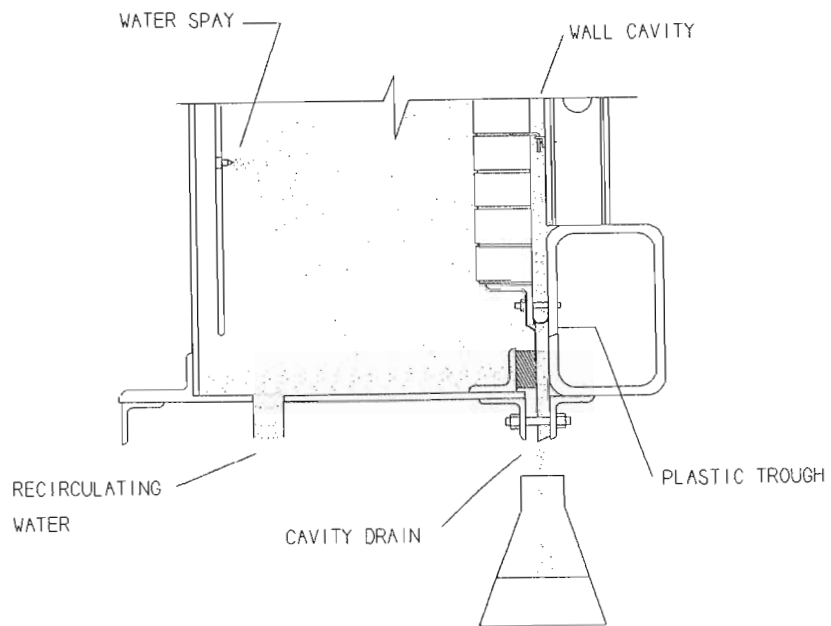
WALL CAVITY DRAINAGE DETAIL
